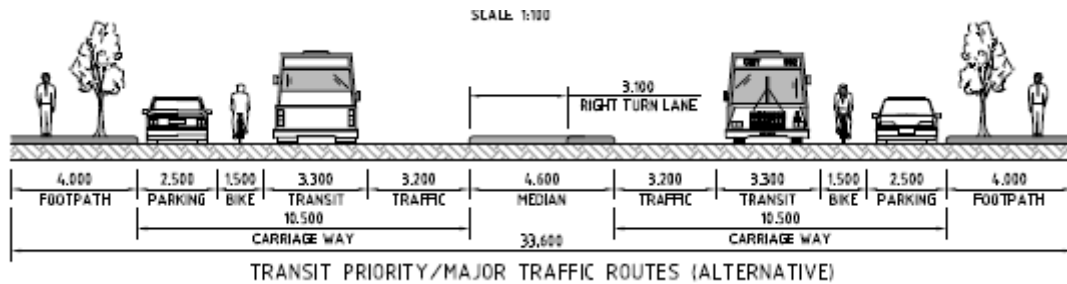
Example of Typical Road Cross Section showing dedicated transit lane for buses (light rail to ultimately be accommodated in transit lane)
